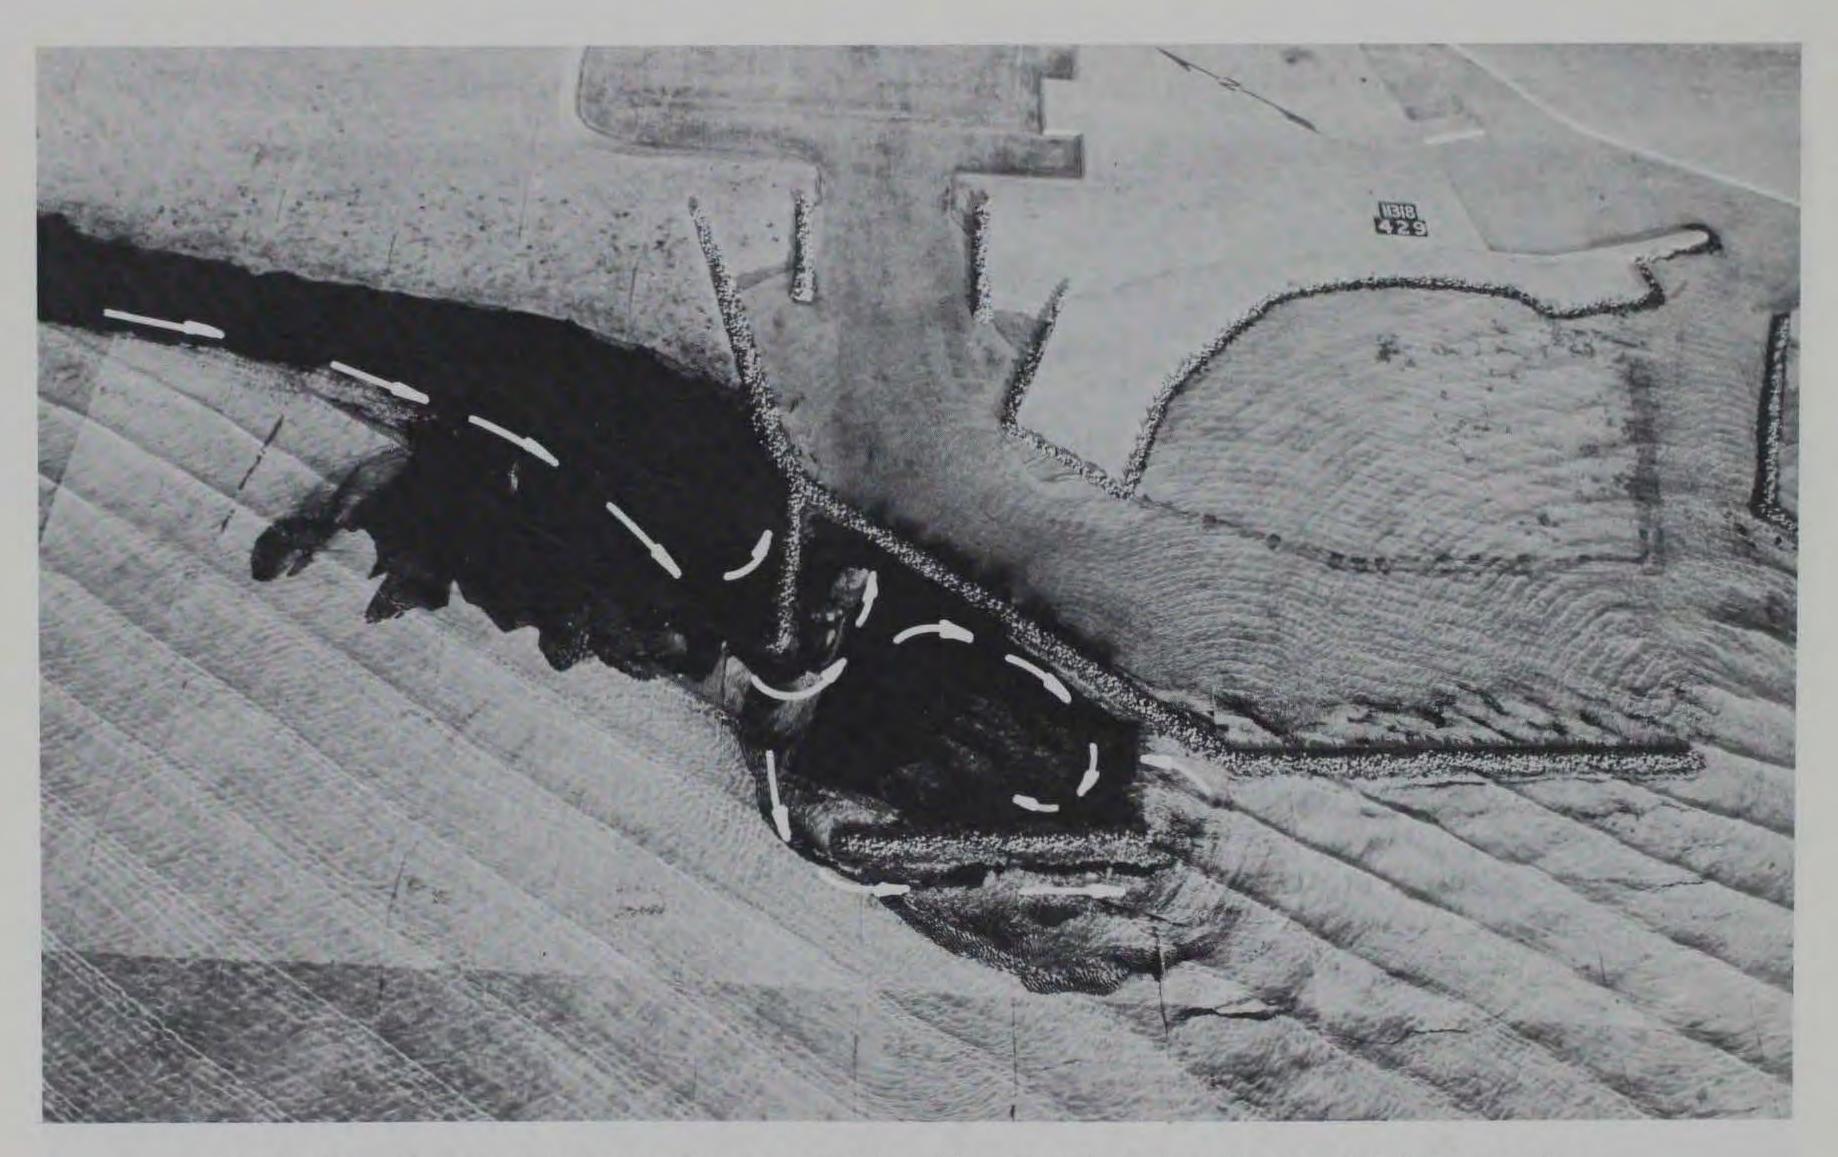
Typical tracer movement for Plan 44 resulting from 7-sec, 10-ft waves from northwest at mhhw
